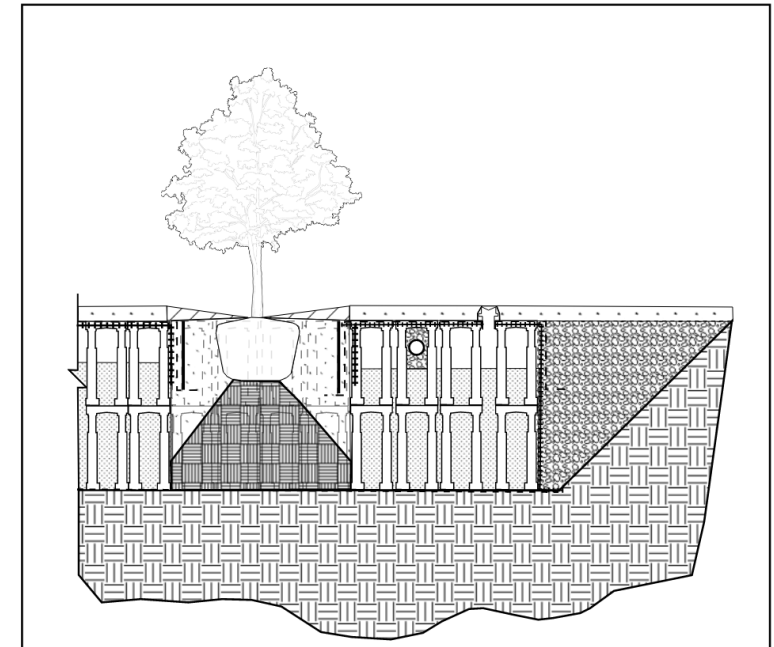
Infiltrating Structural Soil Cell BMP without Underdrain.
